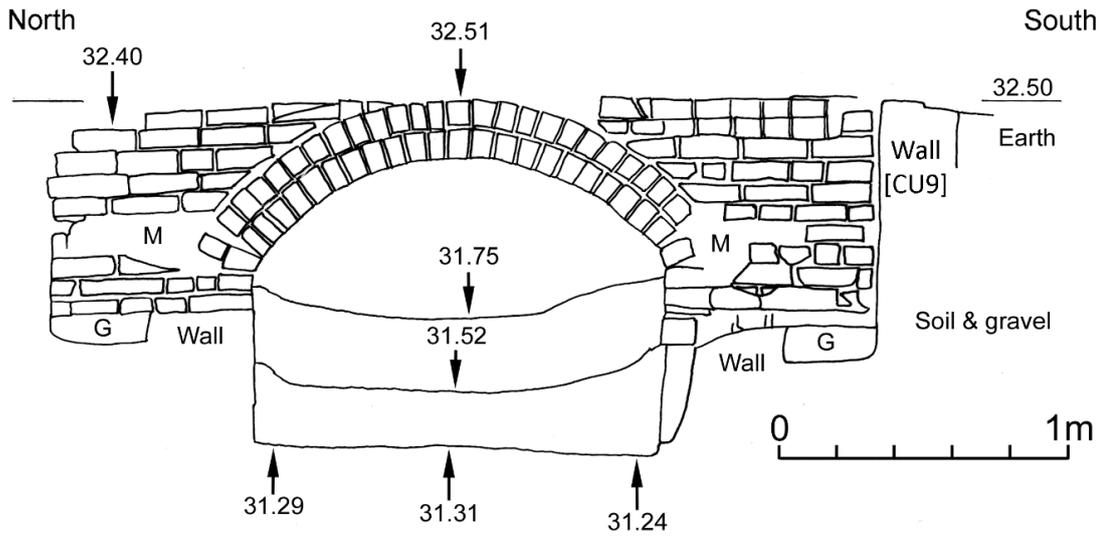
The culvert exit and retaining wall looking east. G = gravel; M = mortar.
